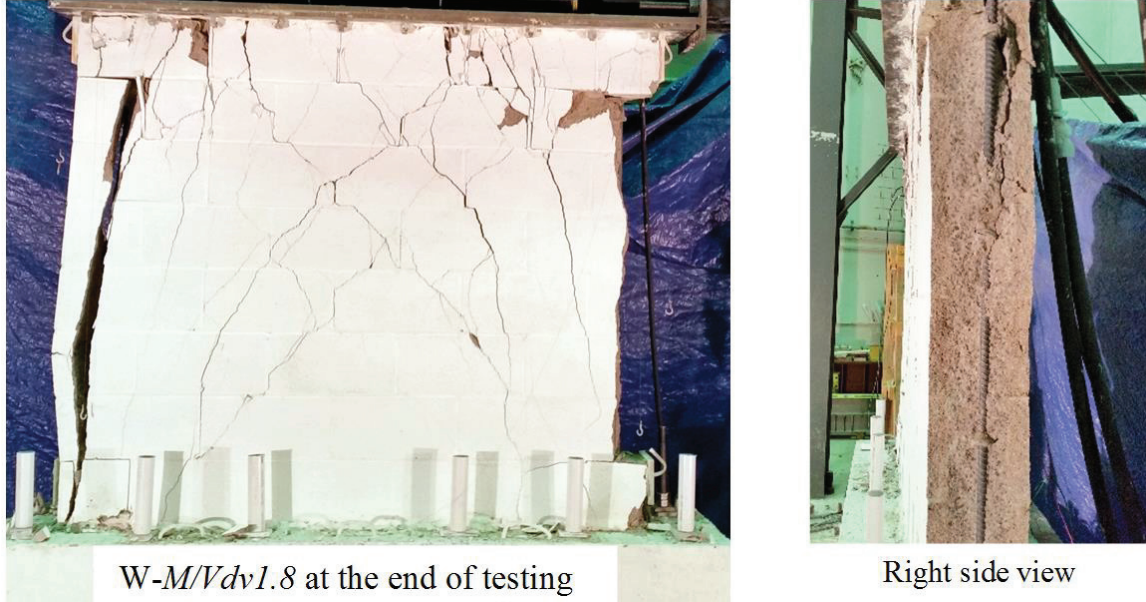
Final crack pattern of tested wall W-M/Vdv1.8
